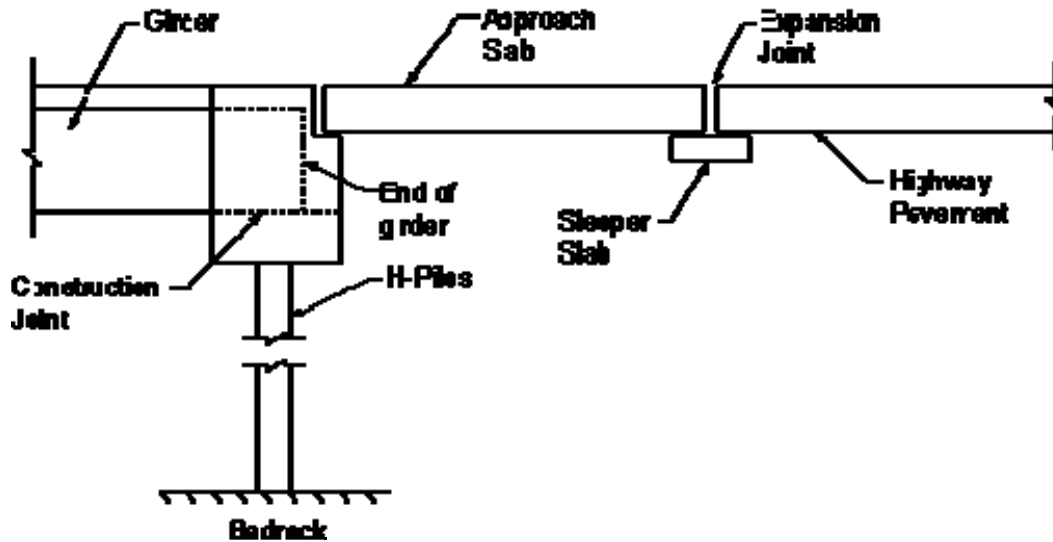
Schematic of an Integral Abutment System with a Sleeper Slab (Seo et al., 2002)
